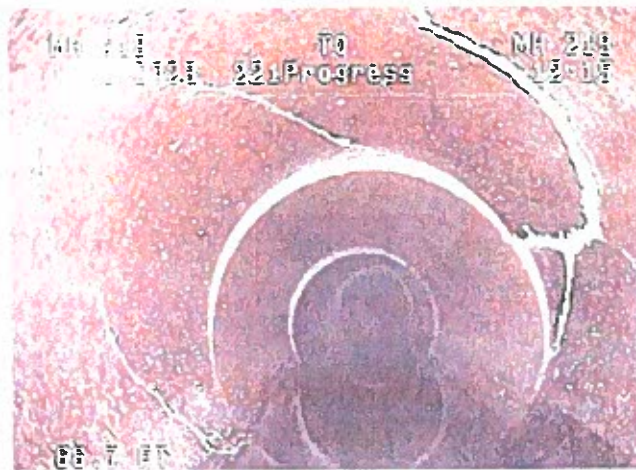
Progress Street - Sewer Main Cracks (66.7')
